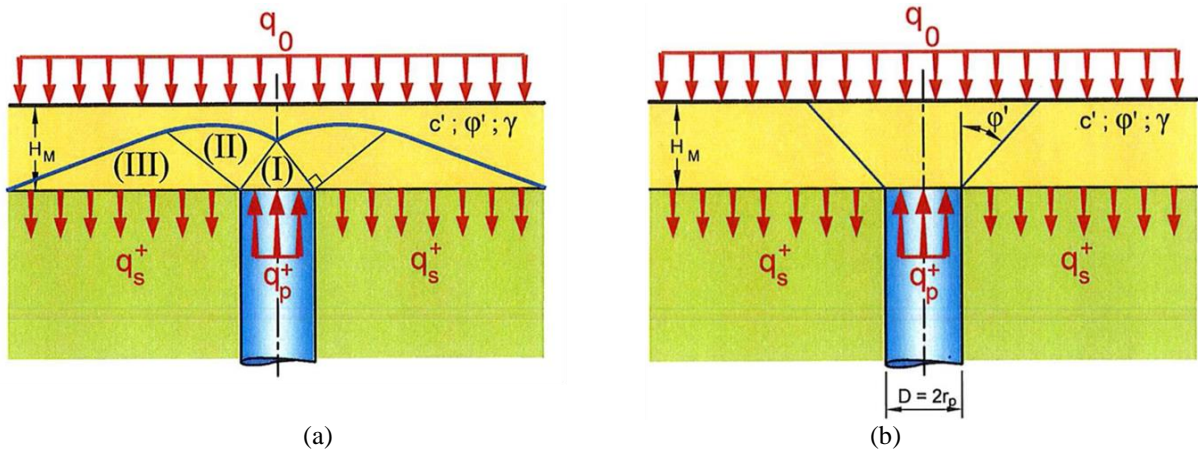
(a) Prandtl failure mechanism for slabs on grade, rafts or footings and thick embankments and (b) punching failure for thin embankments [8]
